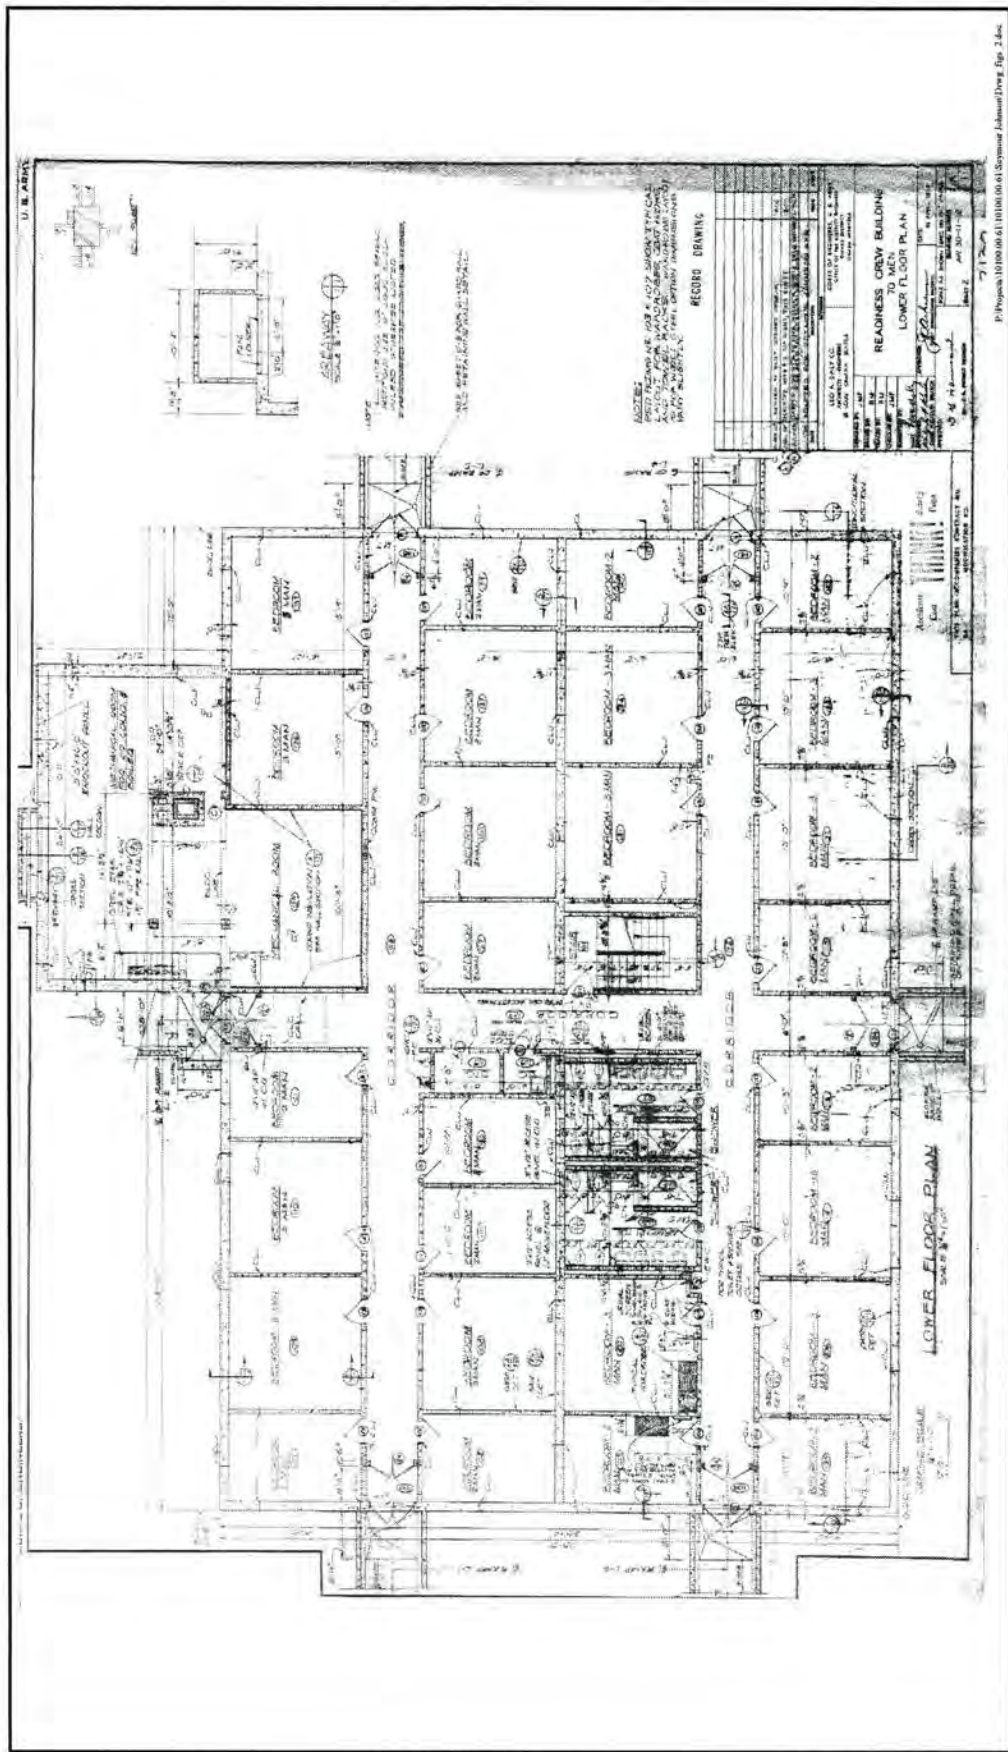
Building 2130—record drawing, lower floor plan, 1958 (Source: Seymour Johnson Air Force Base Civil Engineering Vault)
